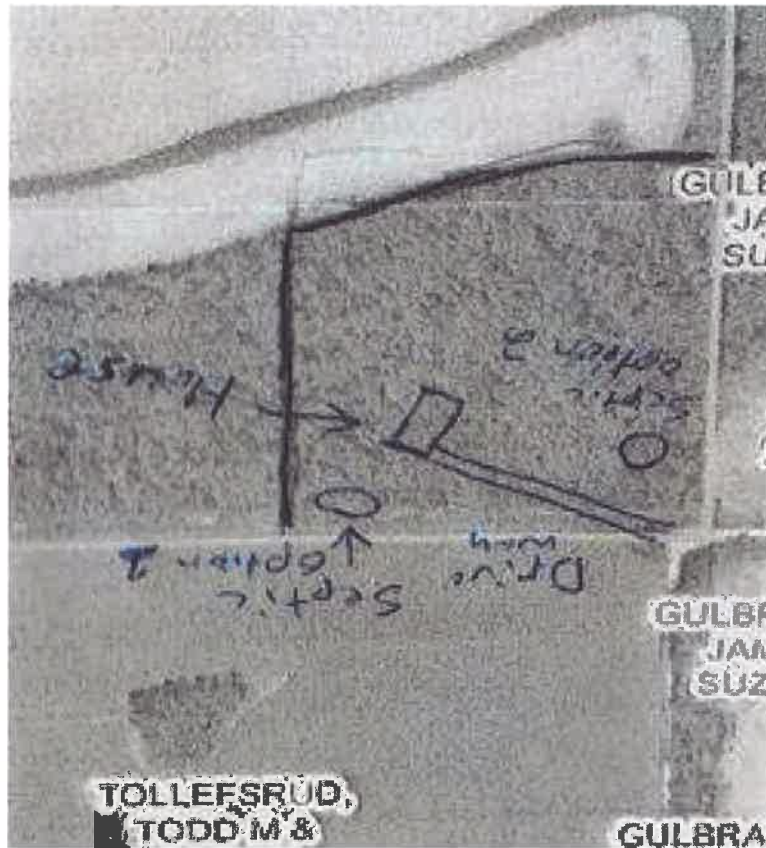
Site plan submitted by the applicant showing the future parcel and location of the dwelling and septic systems.
